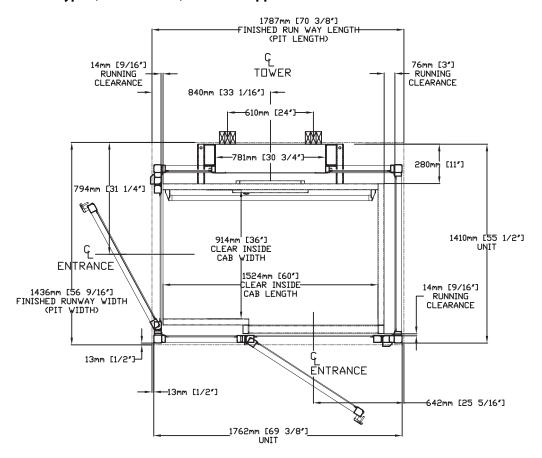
Sample Installation Drawings (Sheet 1) - Hoistway Application
